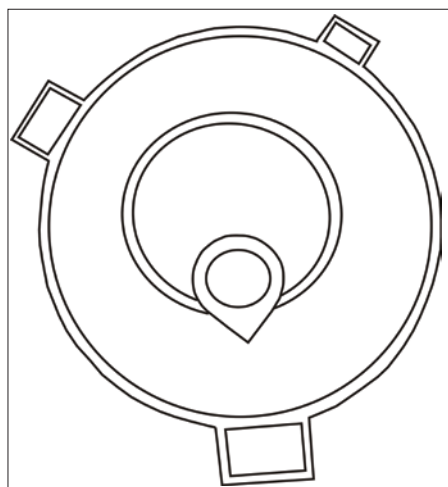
Velika Kladuša – sketch of castle ground (drawing by: M. Procházka)
